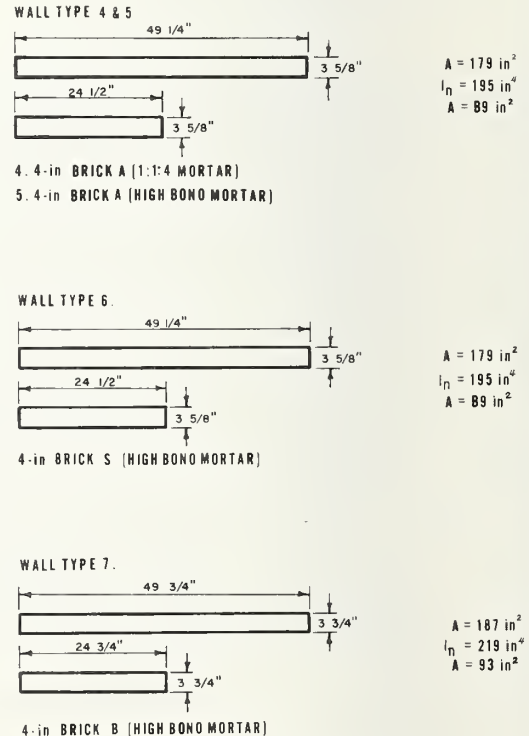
Cross-sectional dimensions of brick walls.
